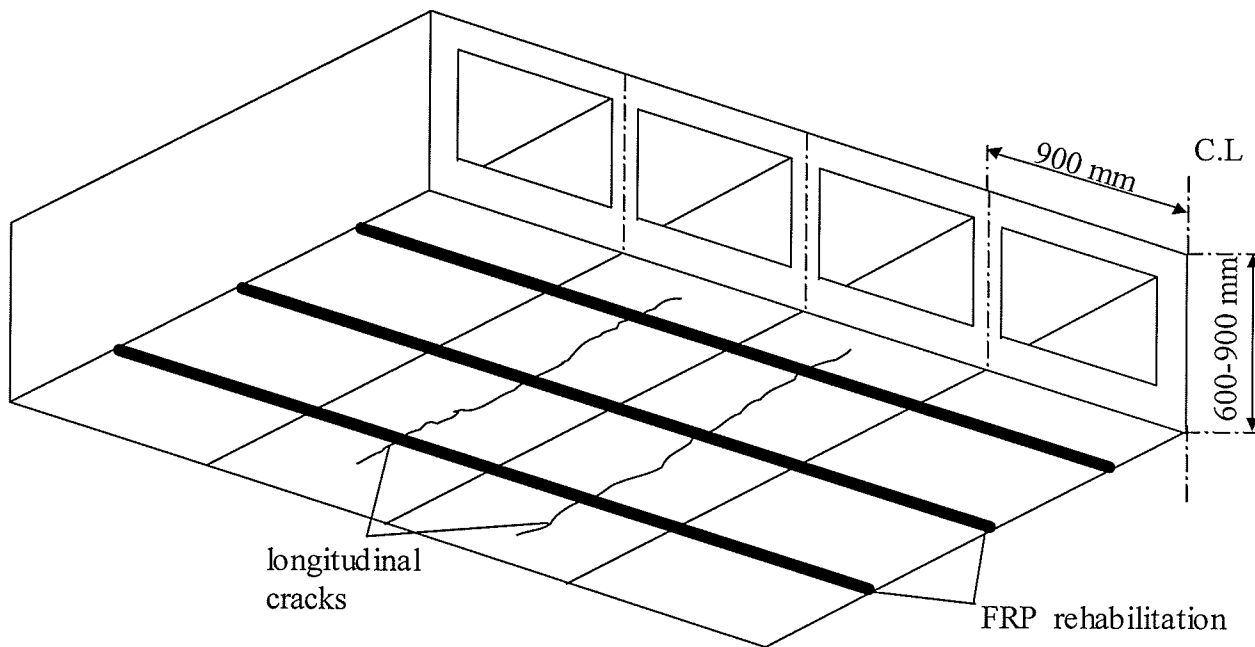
Repair of prestressed box girders using FRP [Finch et al., 1994]
